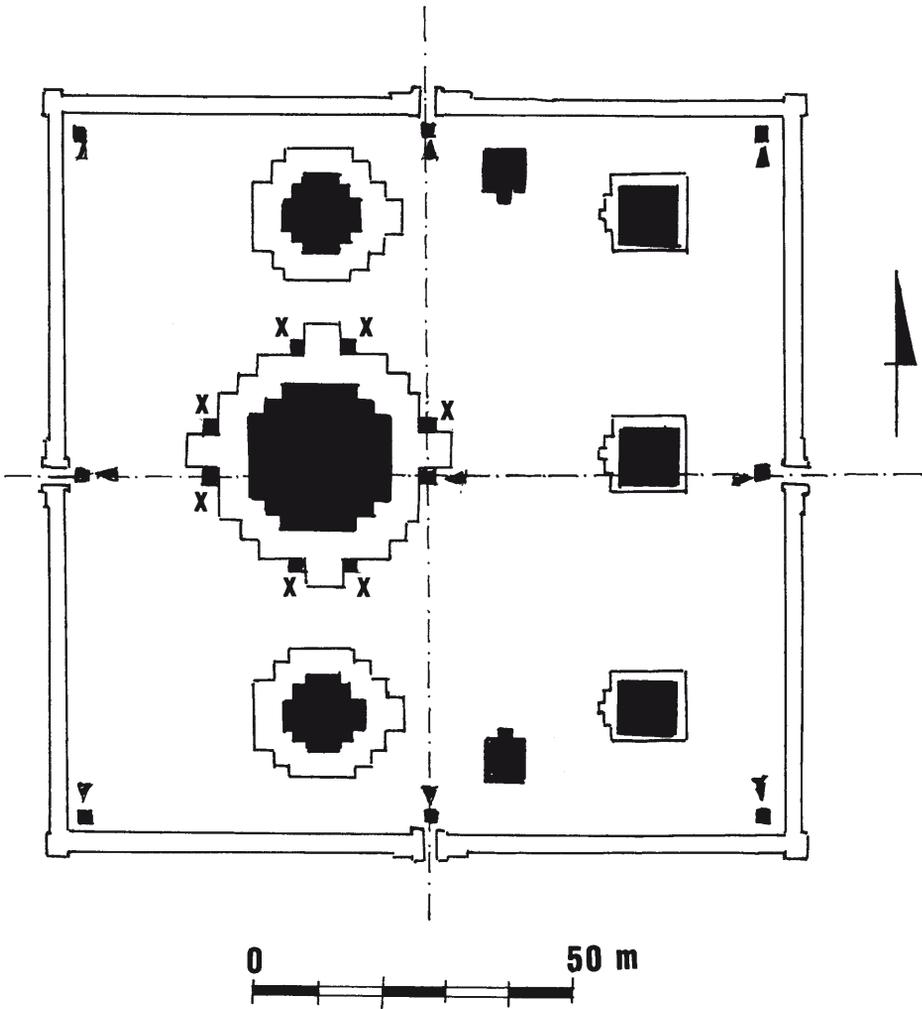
Prambanan, schematic plan of the upper terrace and layout of the temples housing the bench-marks. The letter X indicates the base temples and the arrows point out the location of the doors.
